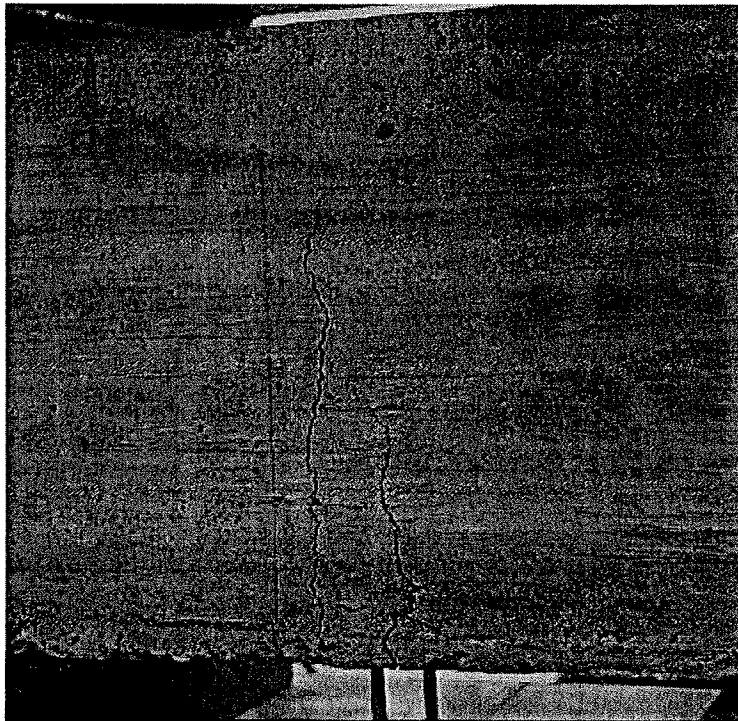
BRC -3 beam with single corrugated bar with a strain gauge.
